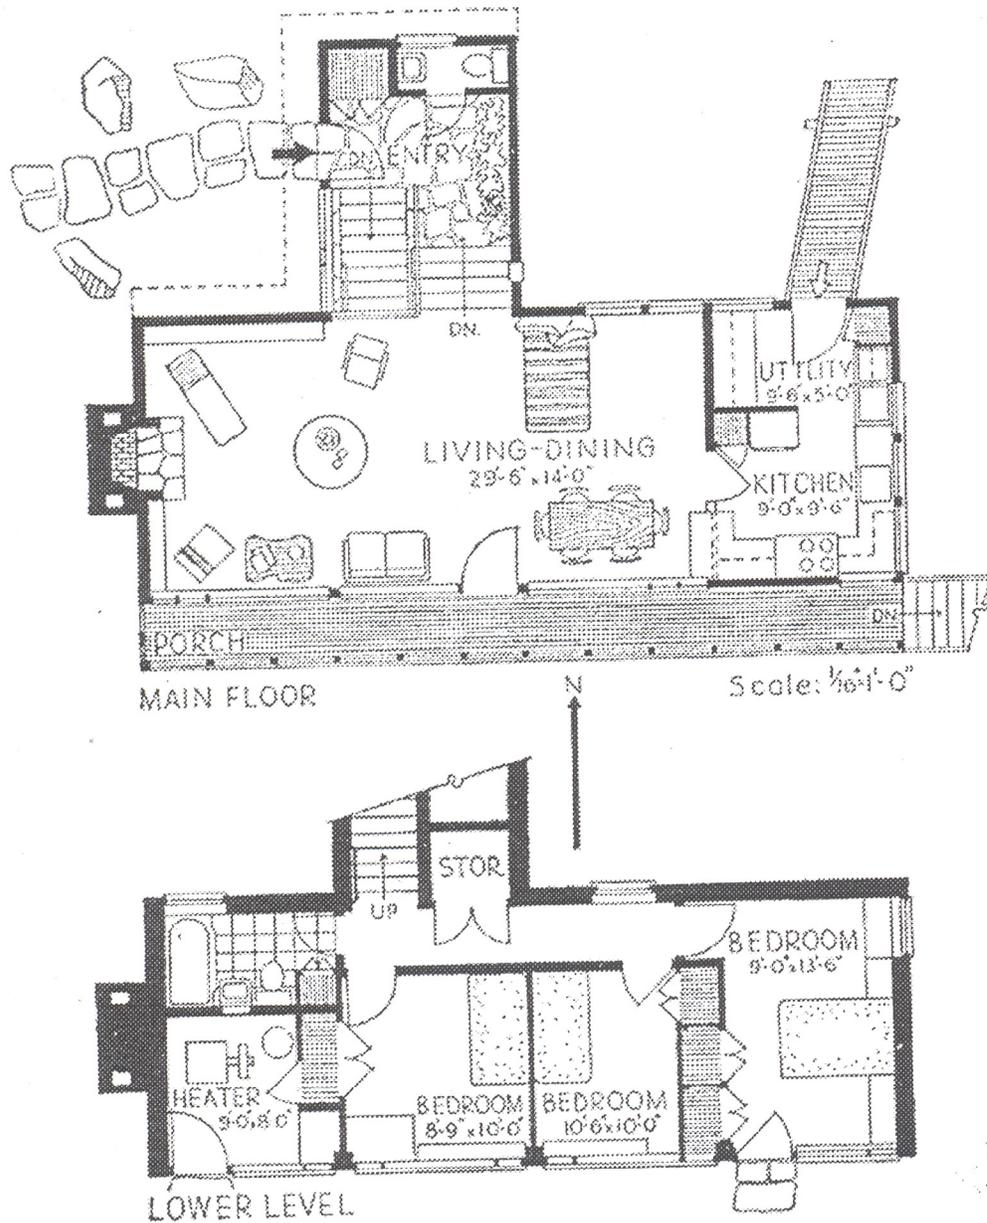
Plan for #16 showing front entry in corner and window wall on south elevation. (*Architectural Forum*, 92 June 1950, Courtesy MIT Museum).
